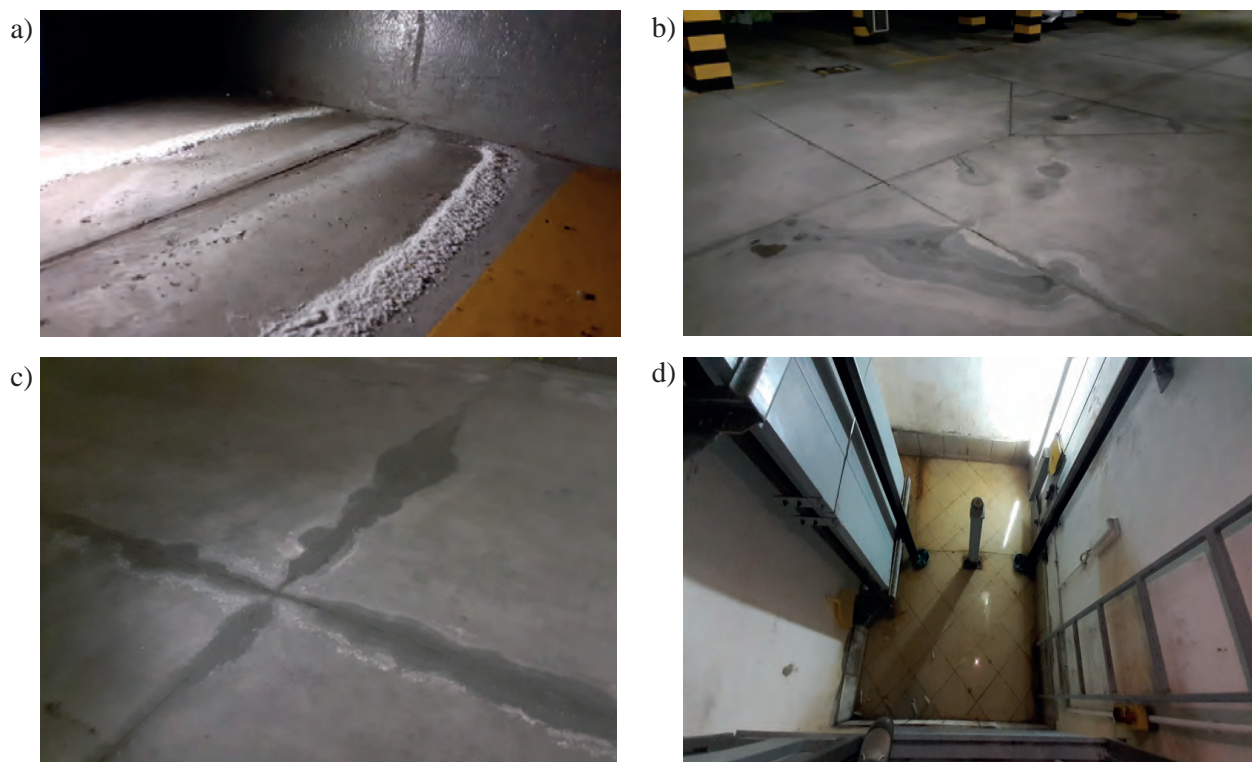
Leaks through (a, b, c) floor / foundation slab, (b) lift shaft
